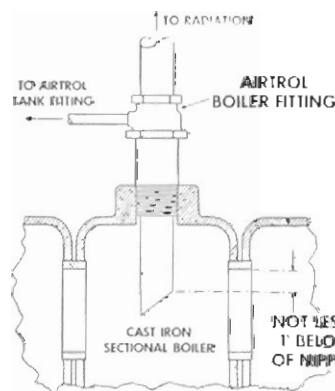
Airtrol Boiler Fitting installation in cast iron boiler showing correct depth of tube.
